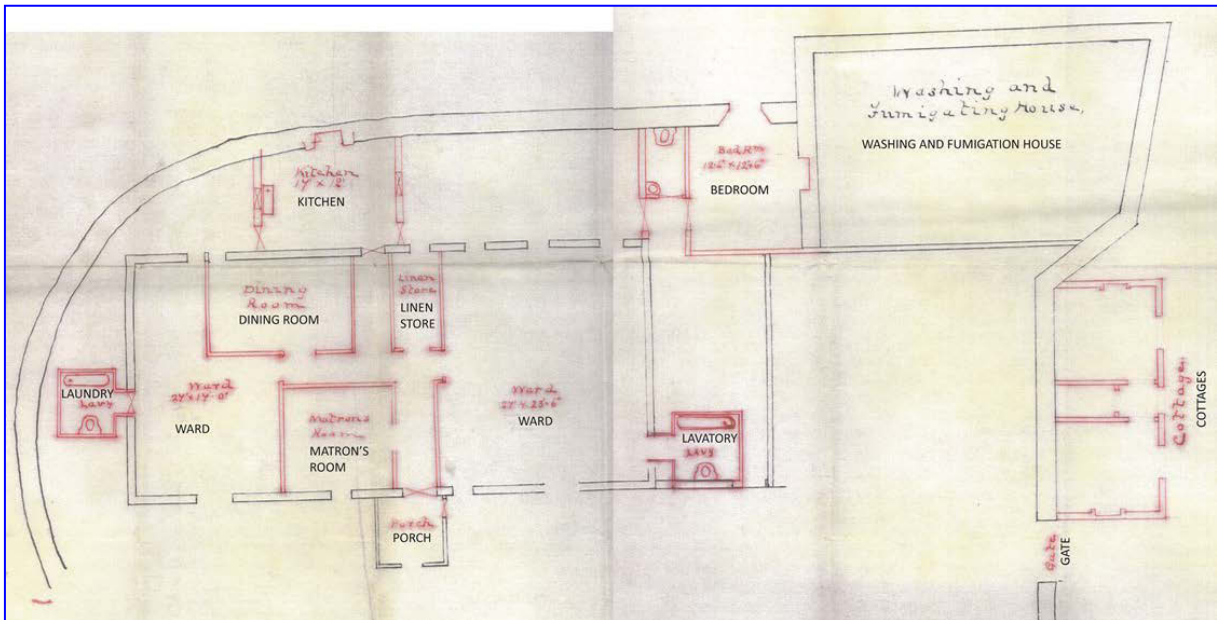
Sketch plan of the layout of the first floor of the hospital, 1899
